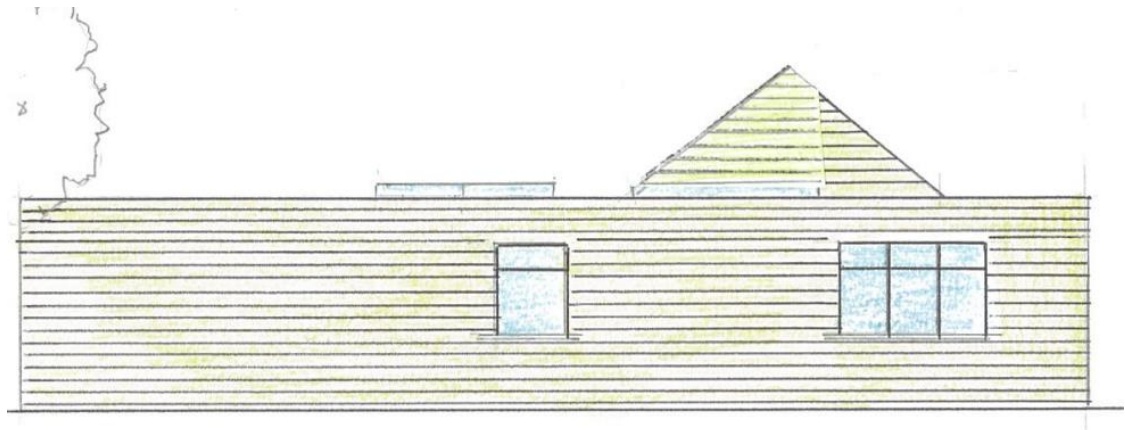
EXTRACT OF PROPOSED AND APPROVED EAST ELEVATION
